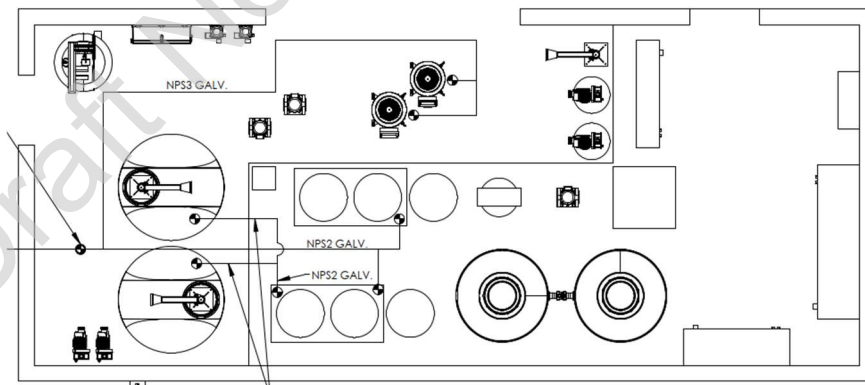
Typical Wash Facility Equipment Room Layout
